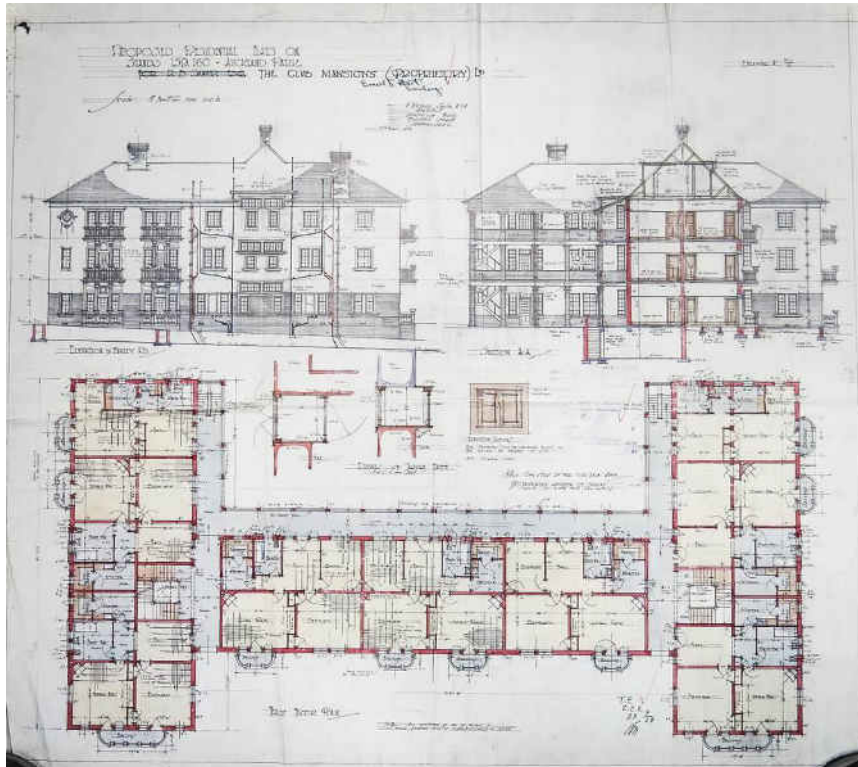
Original plan for proposed residential flats along Kingsway Avenue from 1928\_plans were drawn by the well-known architect P. Rogers Cooke (Source: City Council of Johannesburg, Plans Archive)
